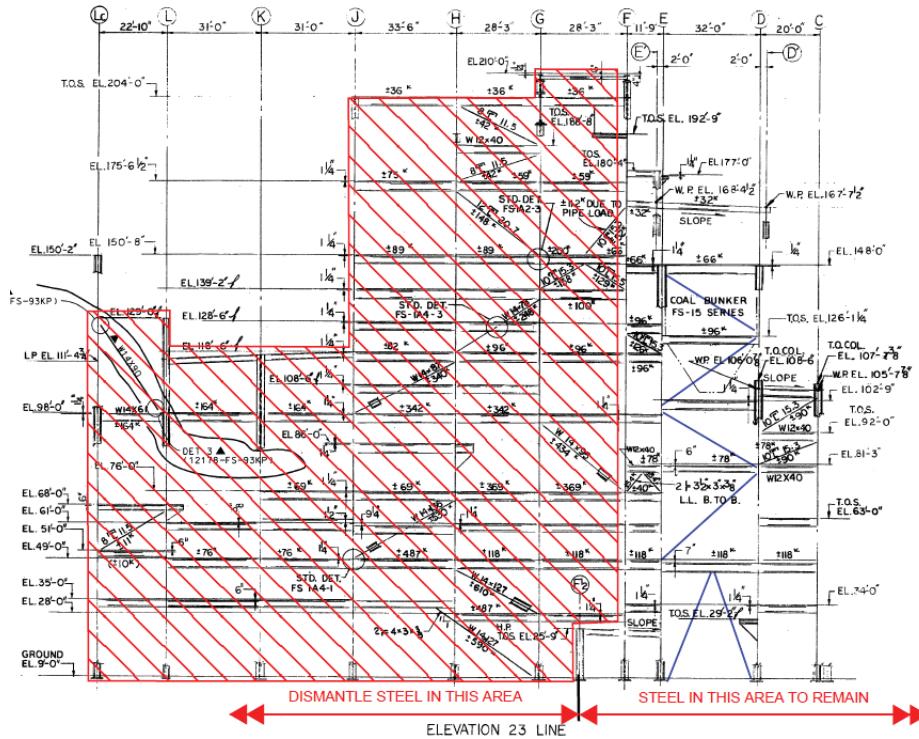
New Vertical Bracing and Boiler Steel Demolition
